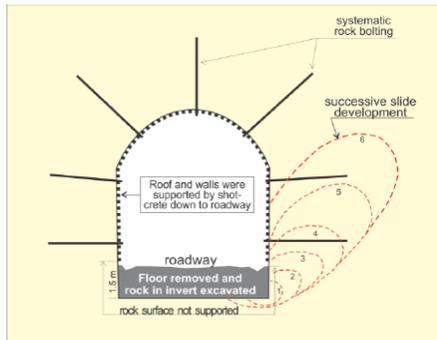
Possible development of the failure, mainly in the right side (looking downstream)
